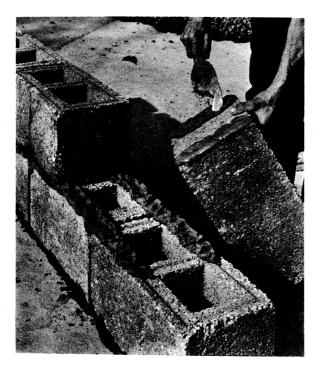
Shell bedding used to improve the waterproof quality of a single leaf wall built of 9in hollow blocks.
